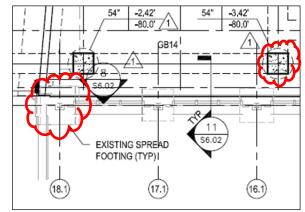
Structural drawing showing the existing spread footings and caissons of the New Addition – Courtesy of the Whiting-Turner/Walsh Joint Venture
